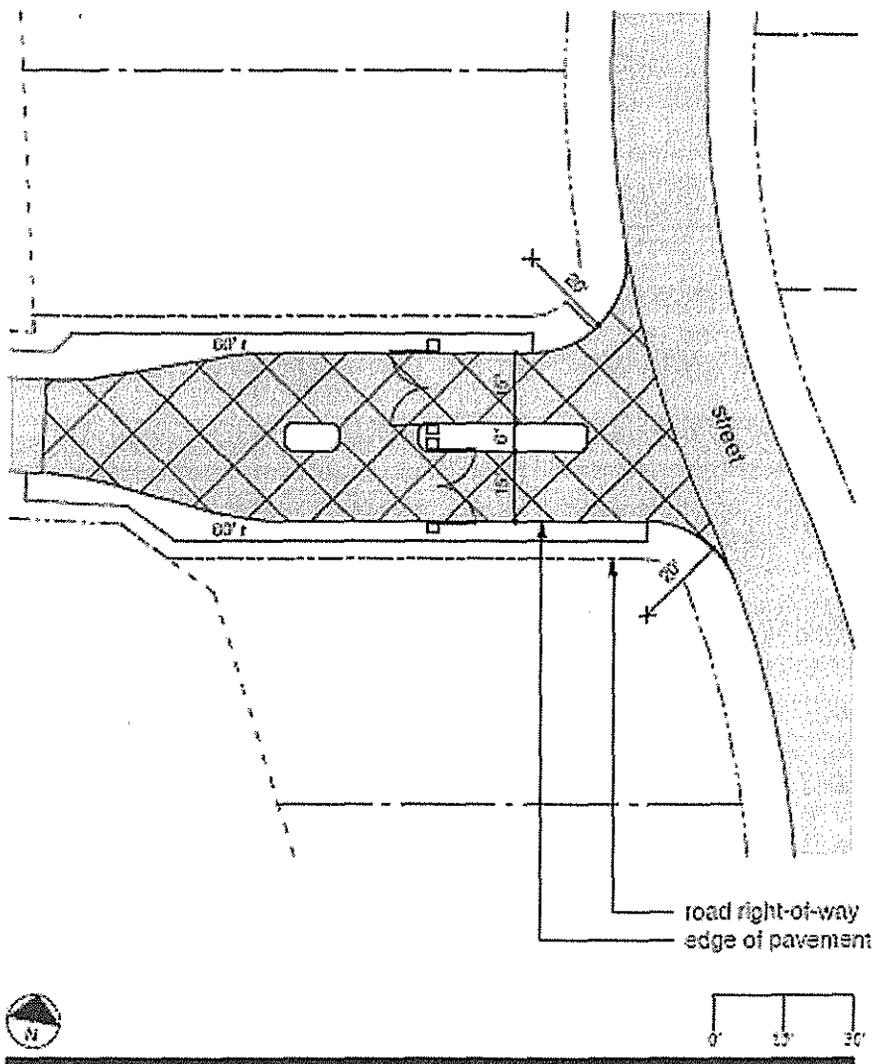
Street Intersection Angles and Radius Variance Request - Subdivision Control Code
